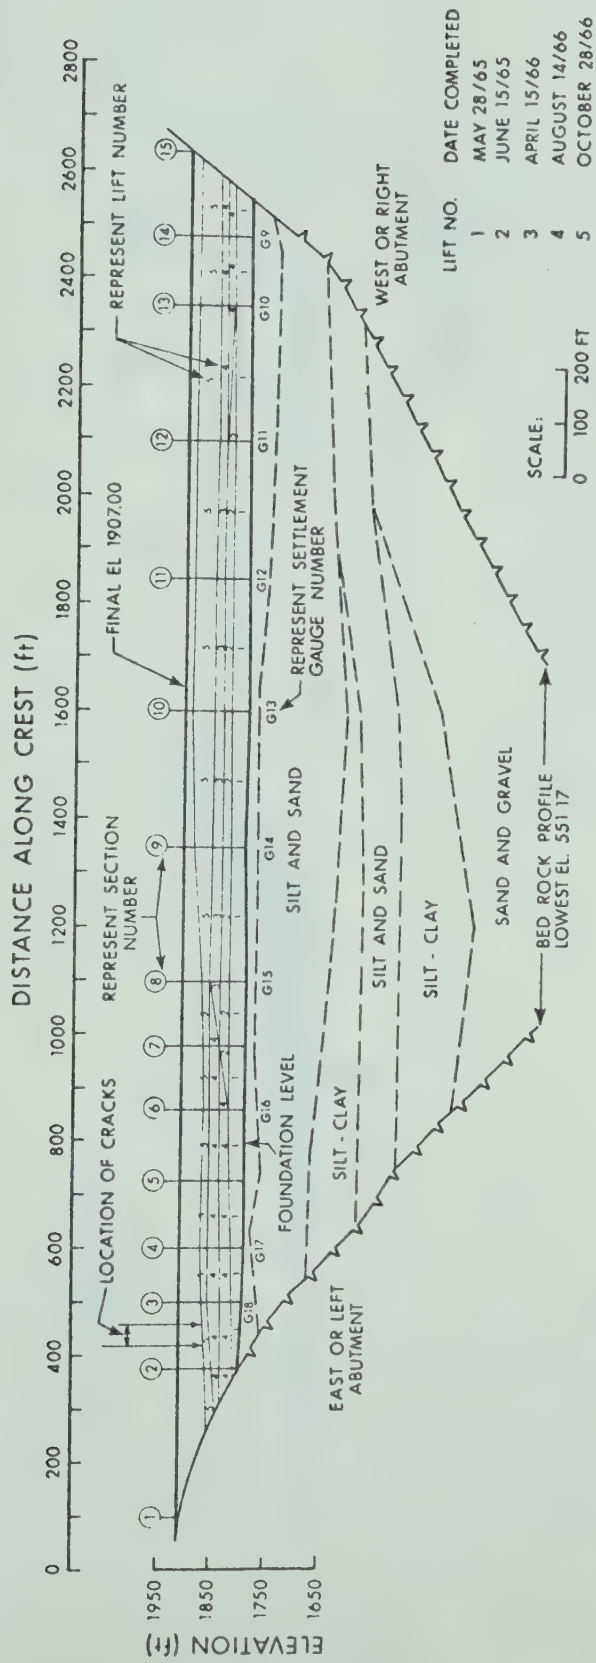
LONGITUDINAL SECTION OF DUNCAN DAM SHOWING CONSTRUCTION SEQUENCE AND LOCATION OF CRACKS
